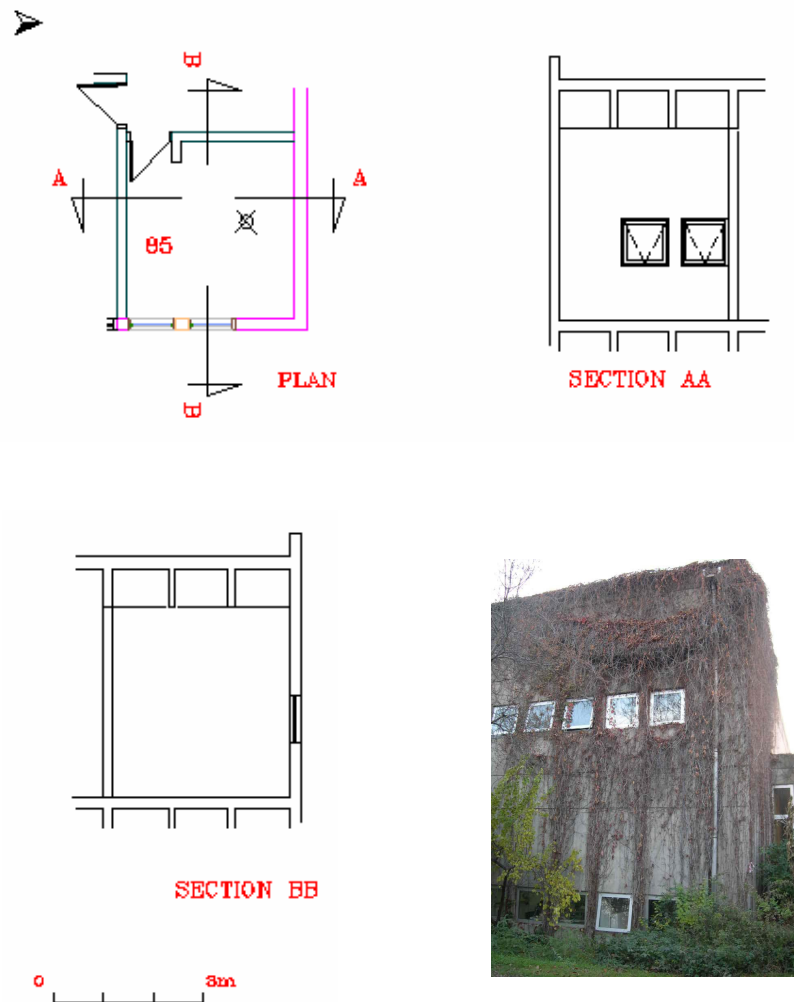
Floor plan, section AA, section BB, and exterior view of Room 85.
